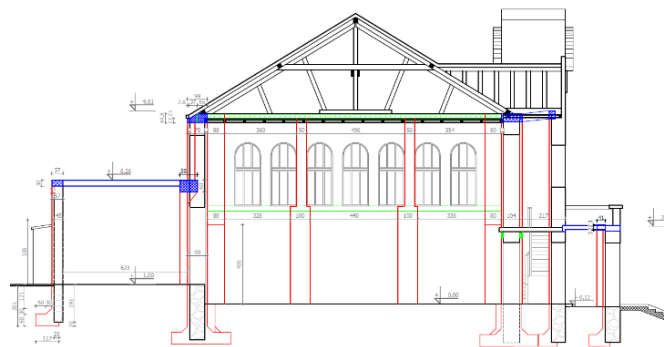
Characteristic cross sections for the proposed strengthening solution: transverse cross section
